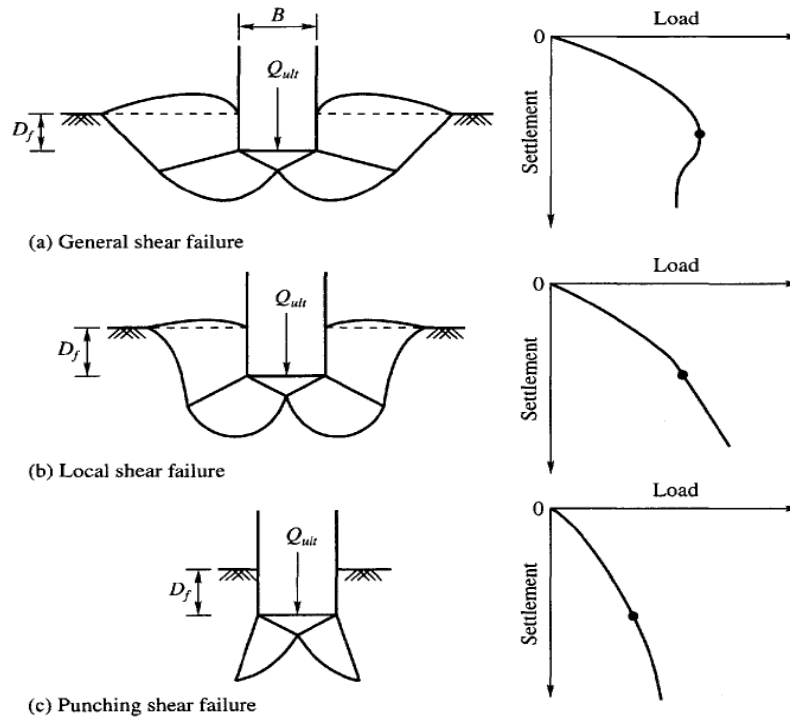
Modes of bearing capacity failure (Vesic 1963).
